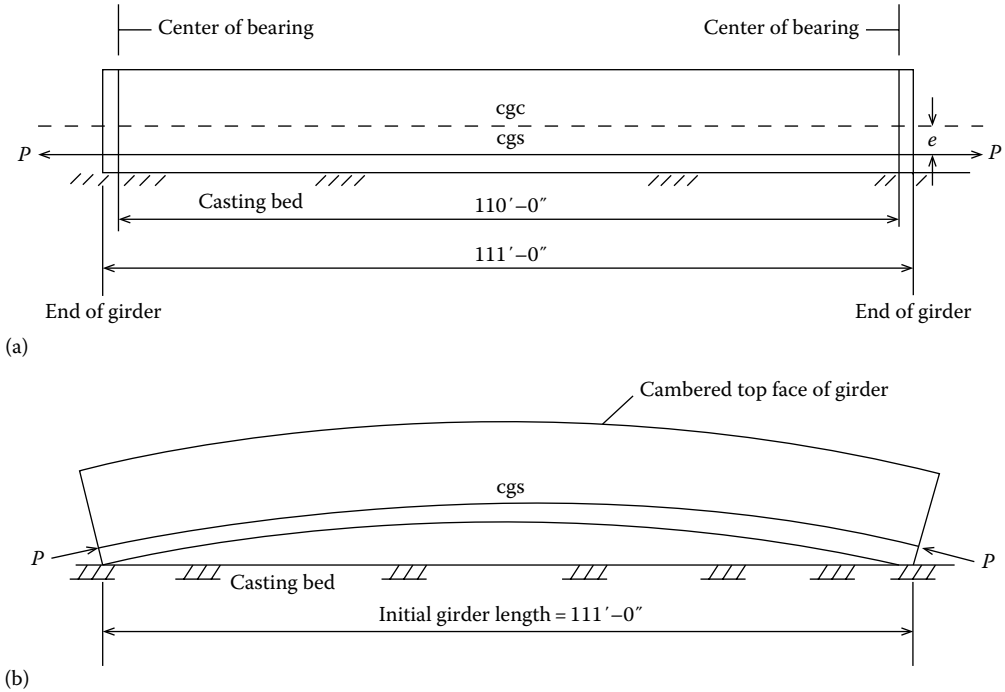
Prestressing a concrete girder: (a) girder in the casting bed with tendons pulled with a force P at eccentricity e , (b) cambered girder after the prestressing force is released and the beam is compressed.
